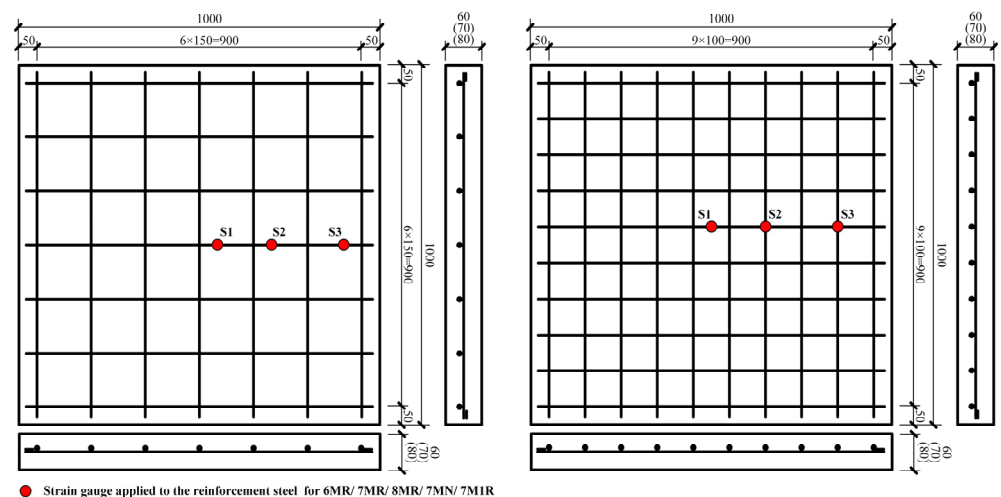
Size and reinforcement layout of RCP specimen (mm).
